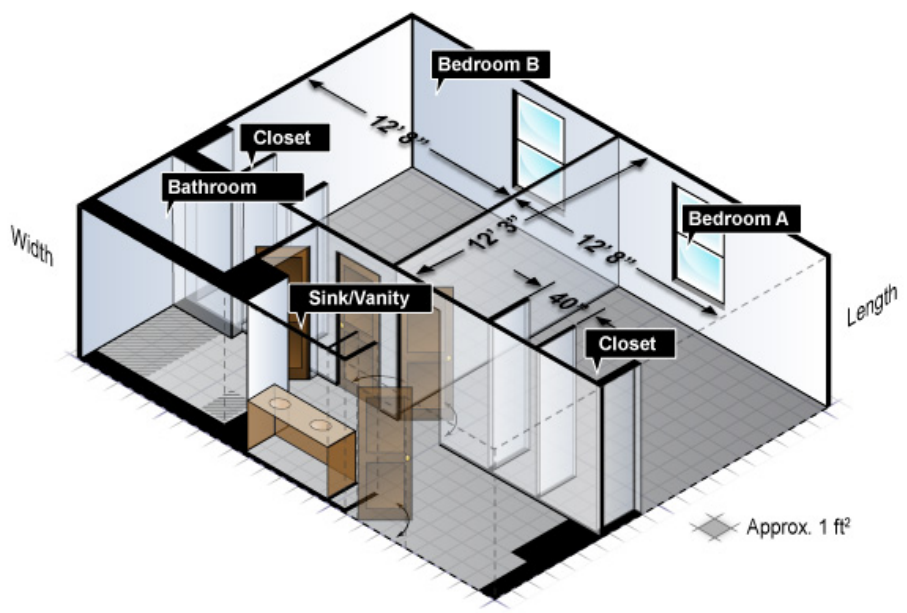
TSS: Semi-Suite Floor Plan (obtained from Purdue University Residences)
